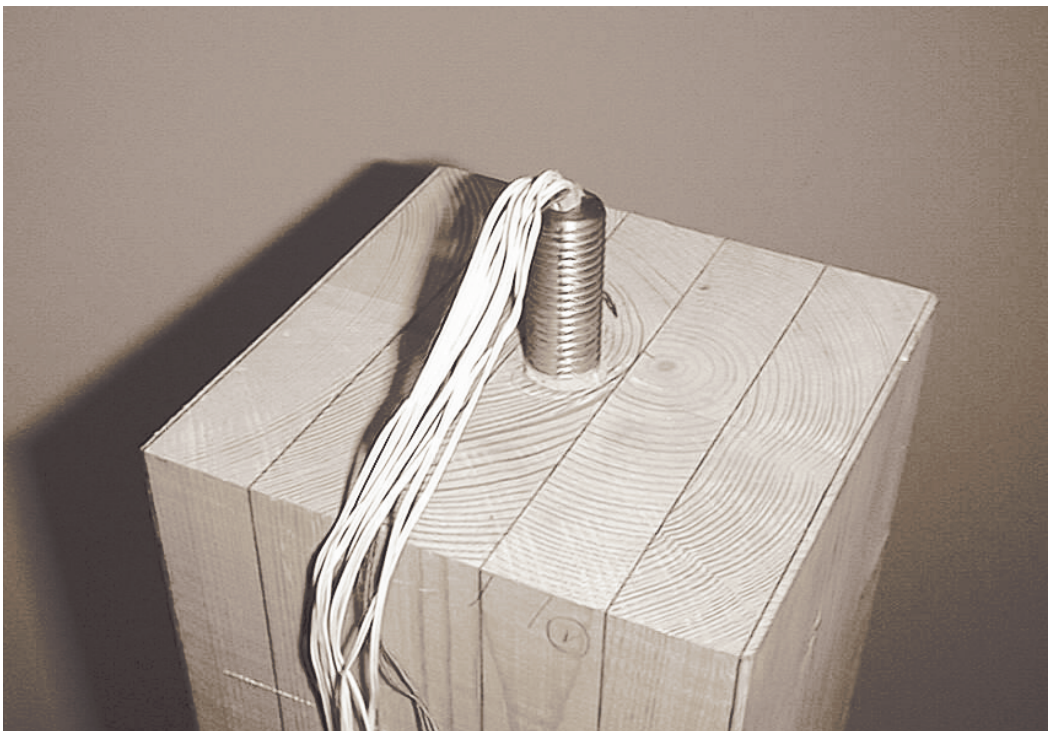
Photograph of the end face of specimen No. 1 with the protruding rod end and sticking out thermo- and strain gauge wires
